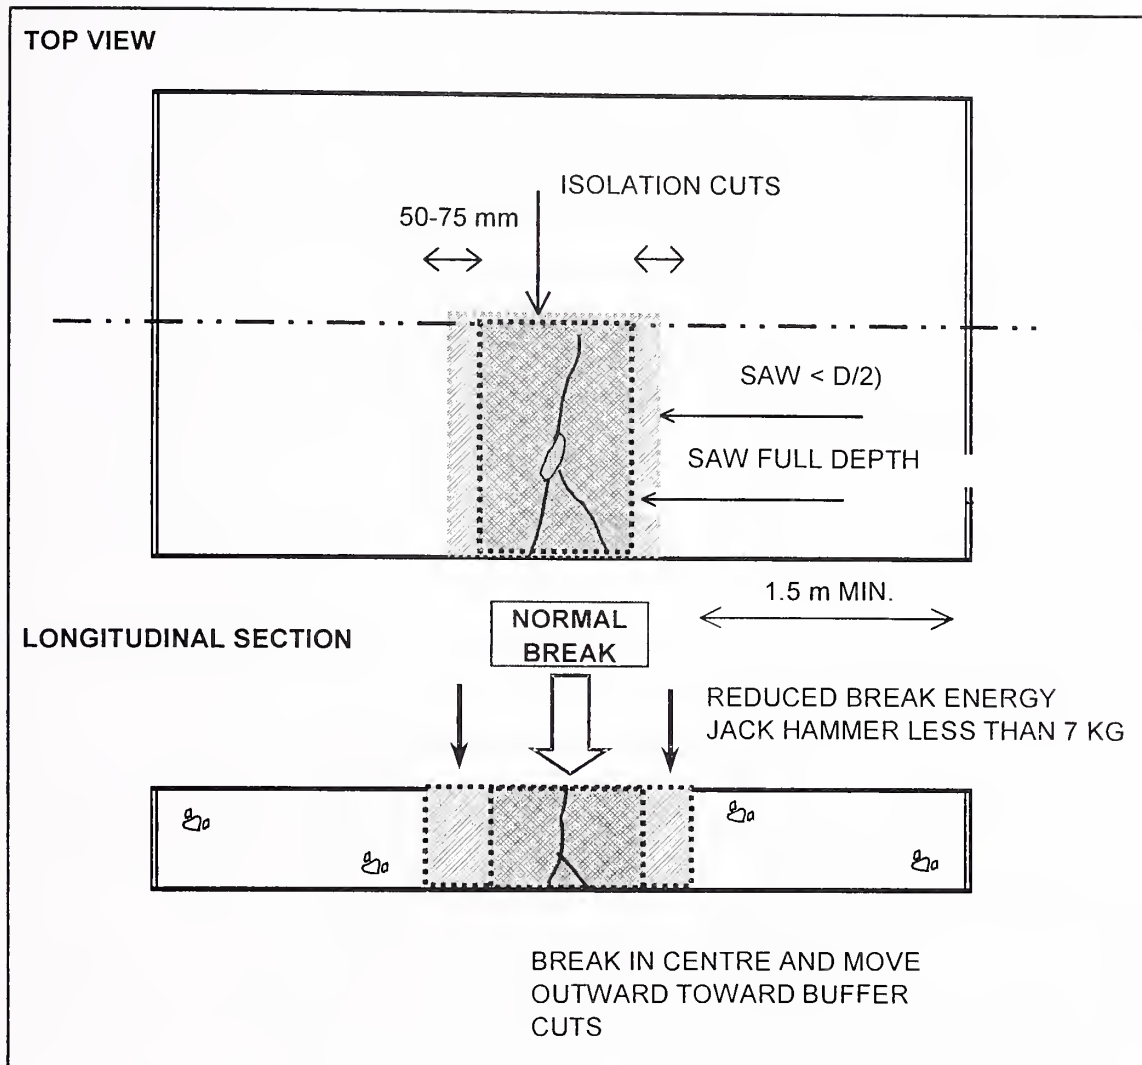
Buffer Cuts for Protecting Repair Perimeters from Undercut Spalling
